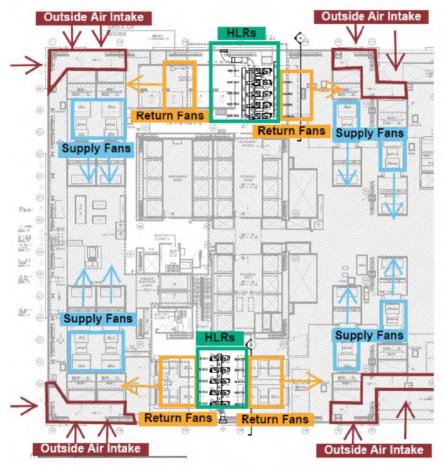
7th floor mechanical room layout with two sets of 10 HLR modules installed near the AHUS' intake of plenum return air
